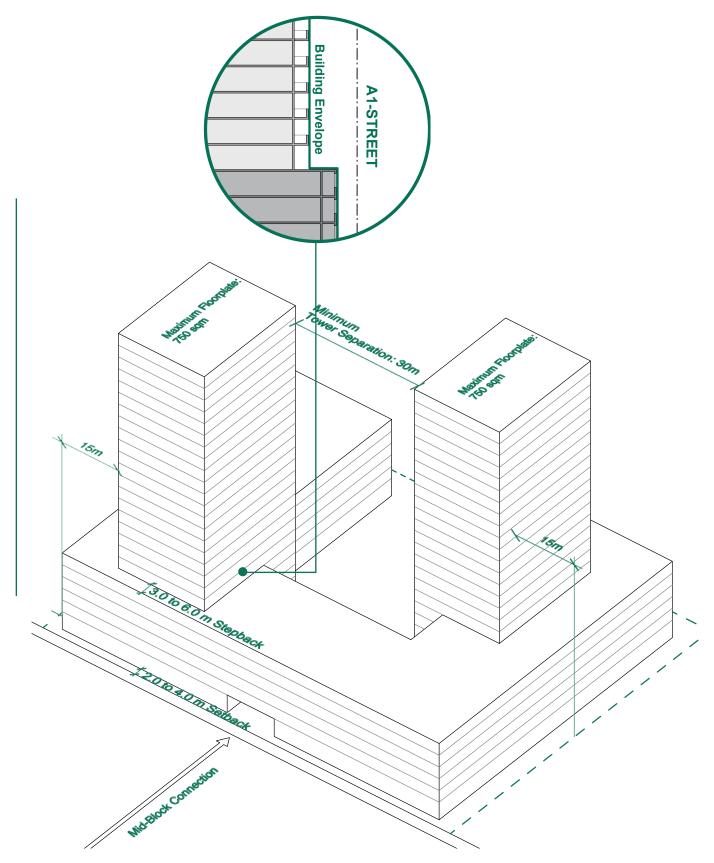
Frontage on an A1 Street. Tower separations, setbacks and floor plate sizes are also indicated.
